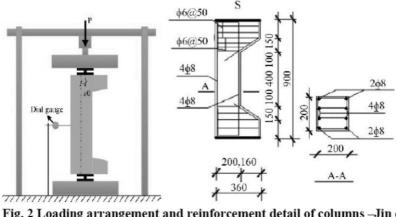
Loading arrangement and reinforcement detail of columns –Jin et al. (2016)
